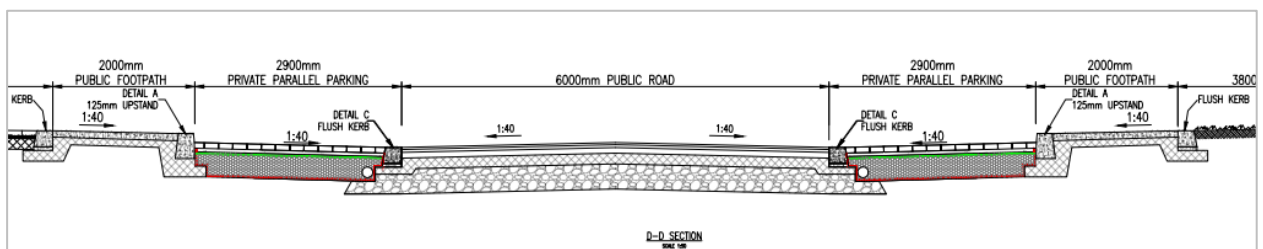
Extract of Proposed Phase 2 Main Access Roads Cross-Section
